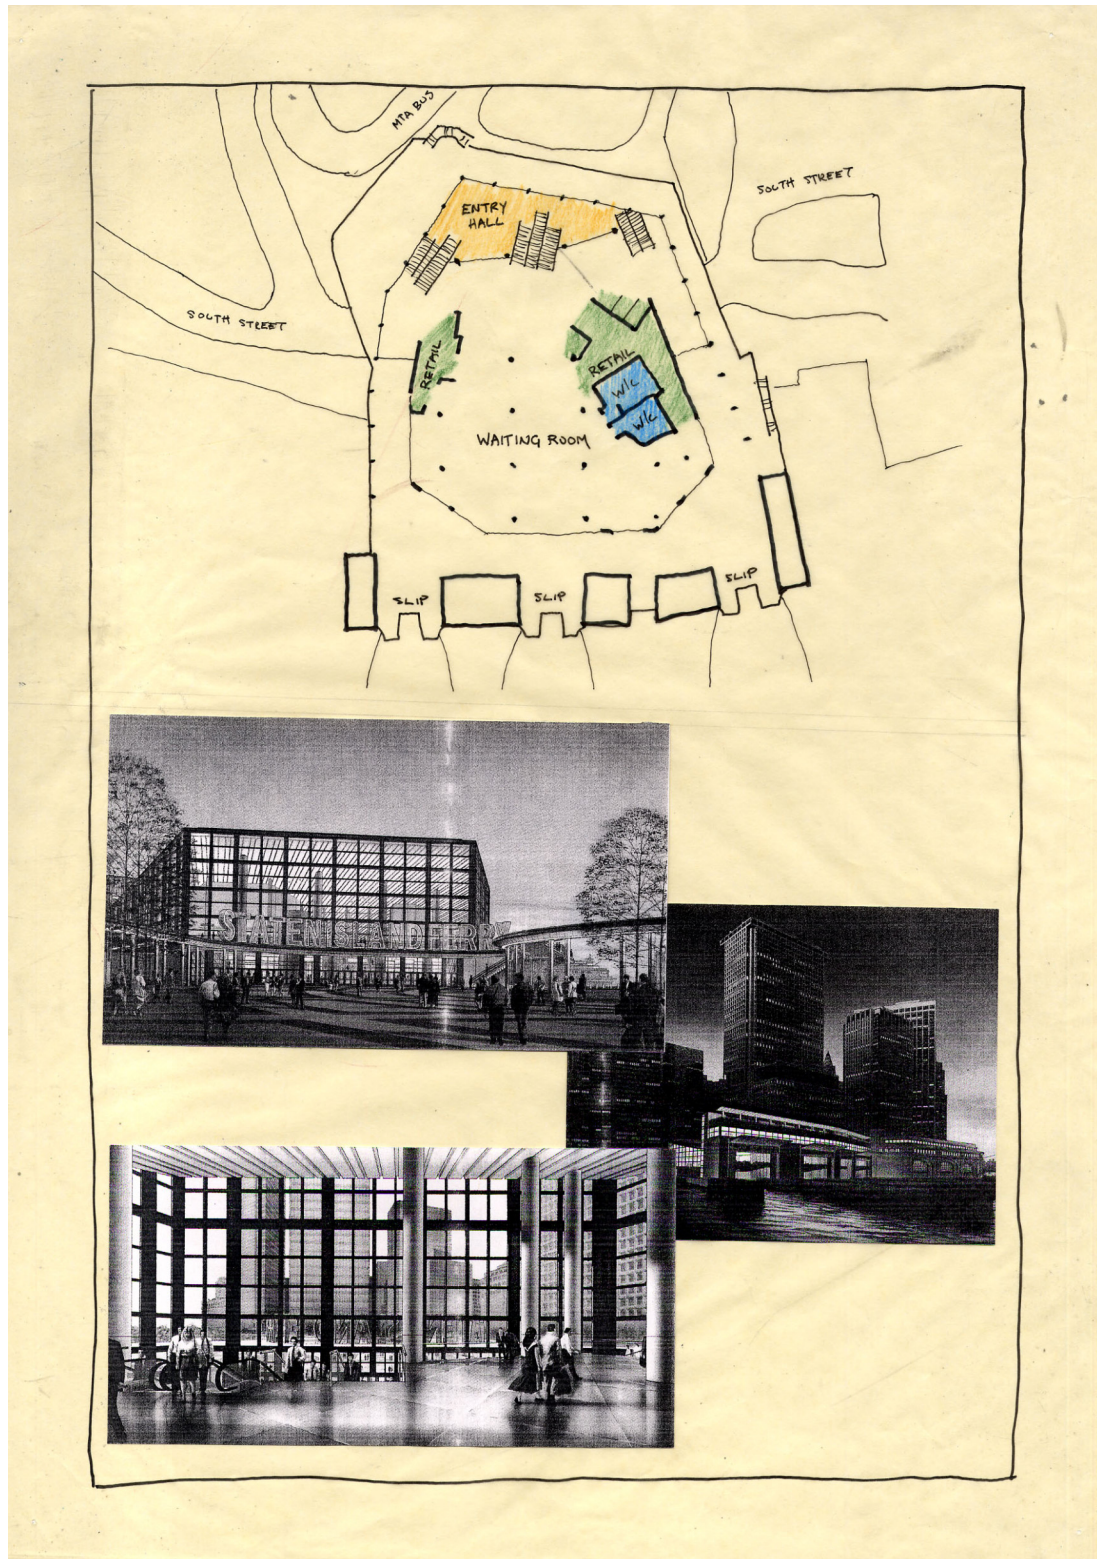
The Staten Island Ferry Terminal by Fredric Schwartz Architects. The building is elevated above the street, allowing thru traffic to pass below it. Retail spaces are placed along the promenade between modes of travel.
